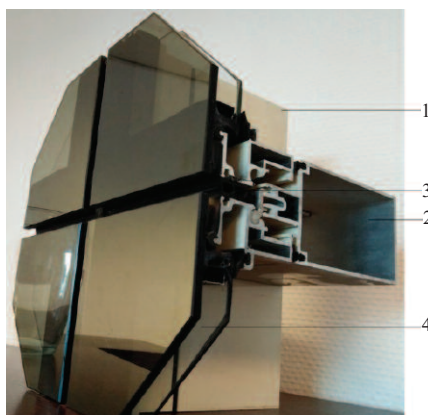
Model of a typical lightweight curtain wall: 1 – mullion; 2 – transom; 3 – sealing and thermal insulation fastening element; 4 – double-glazed unit
